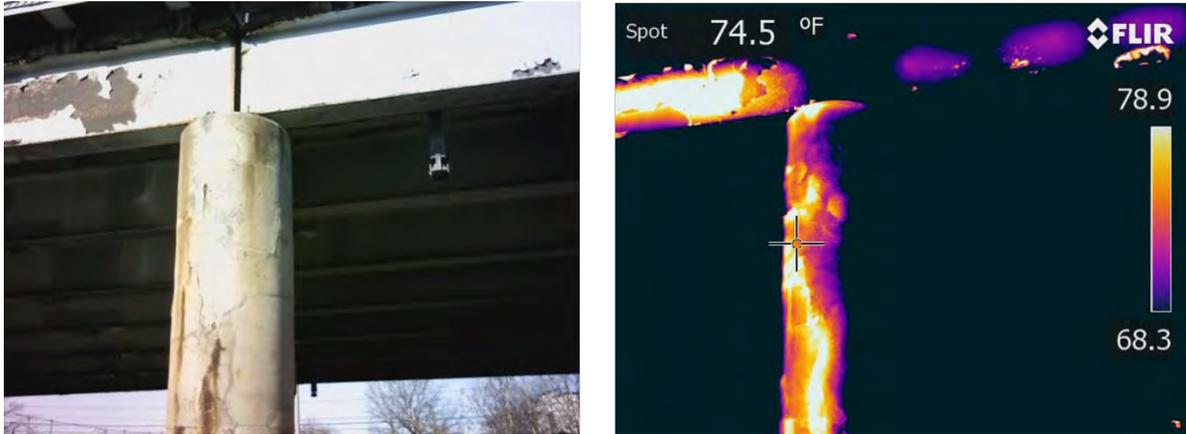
Standard and IR photos of bridge substructure delaminations (Albany, New York)
